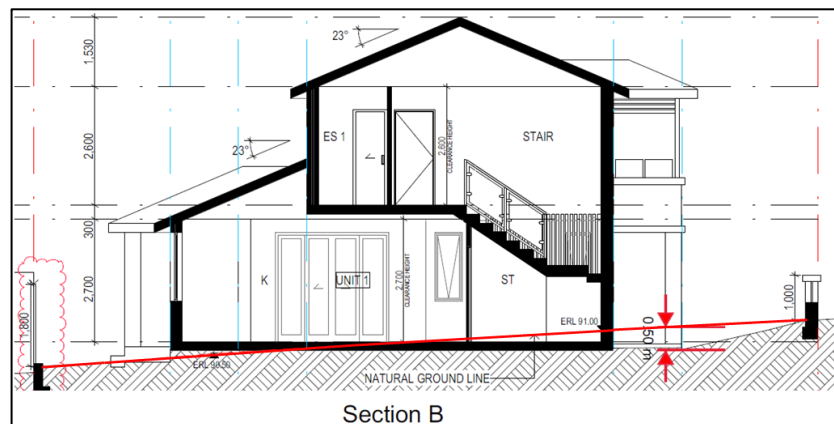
Section B showing the maximum extent of cut within the front setback adjacent to Unit 1.
